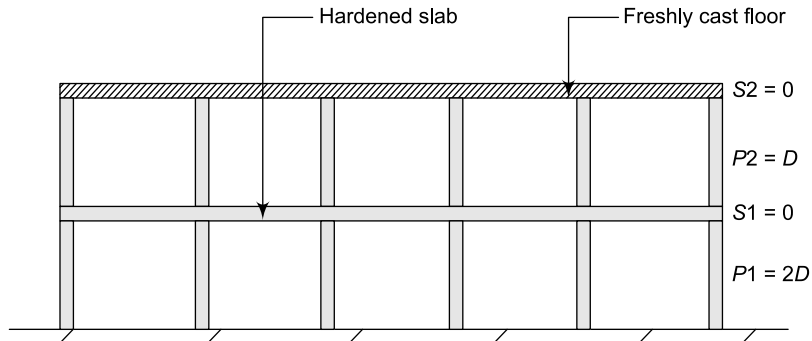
Casting of Slab 2 on the Day 14 (Shores Under Slab 1 and 2 are in Position).
